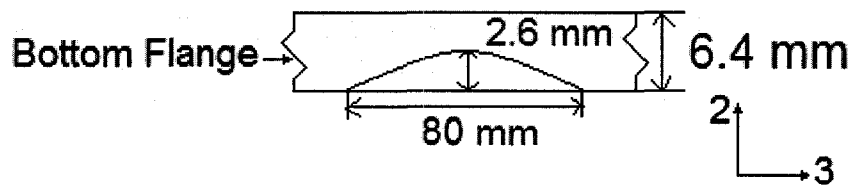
Two-dimensional view of the corrosion at the web-flange intersection
